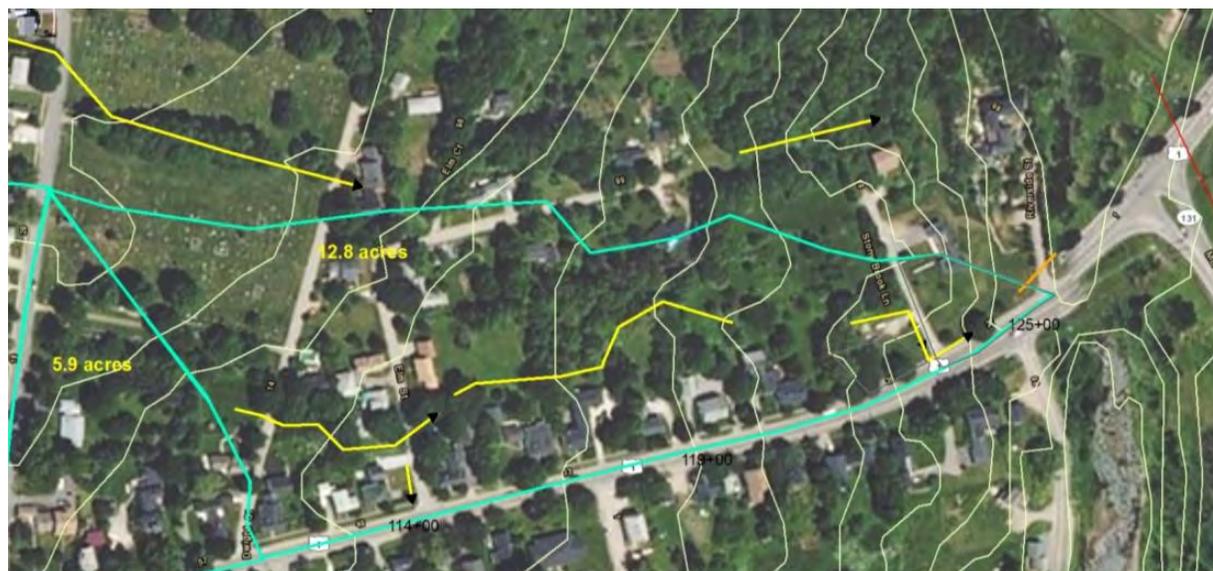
Drainage Areas to culverts at 101+20 and 111+10
